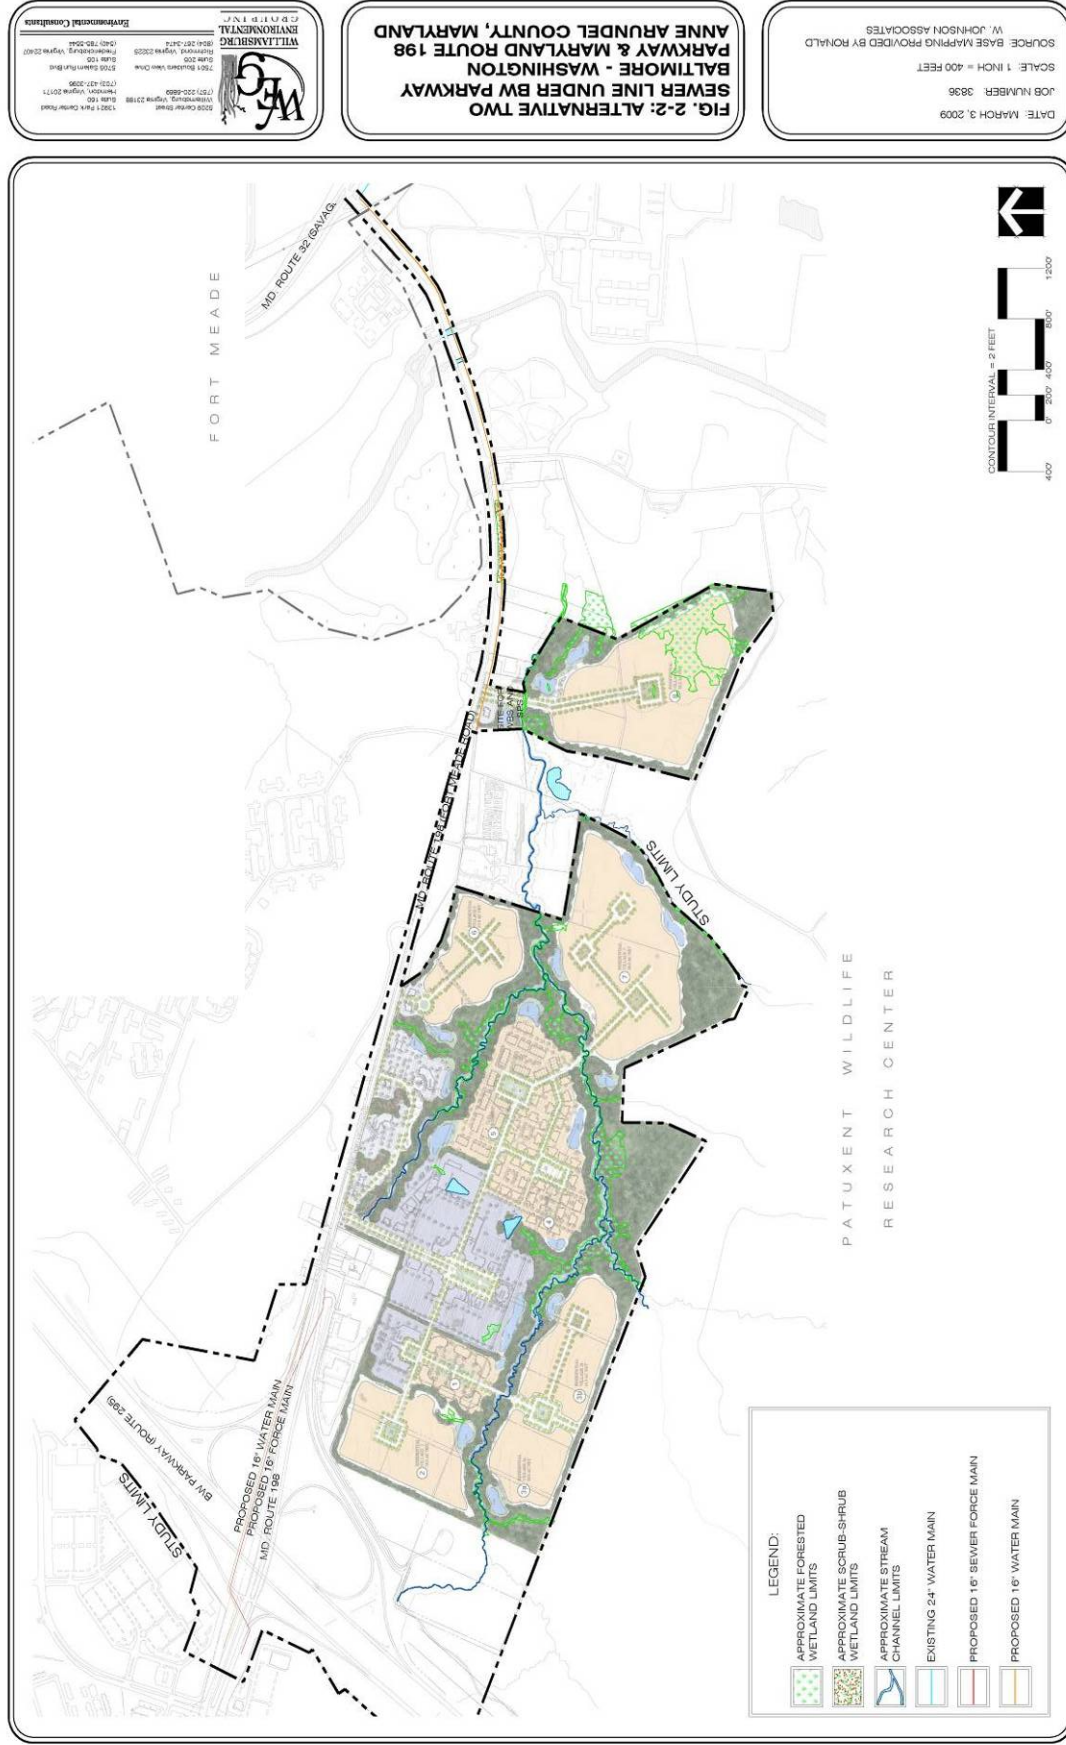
Alternative Two – Sewer Line Under Baltimore/Washington Parkway
